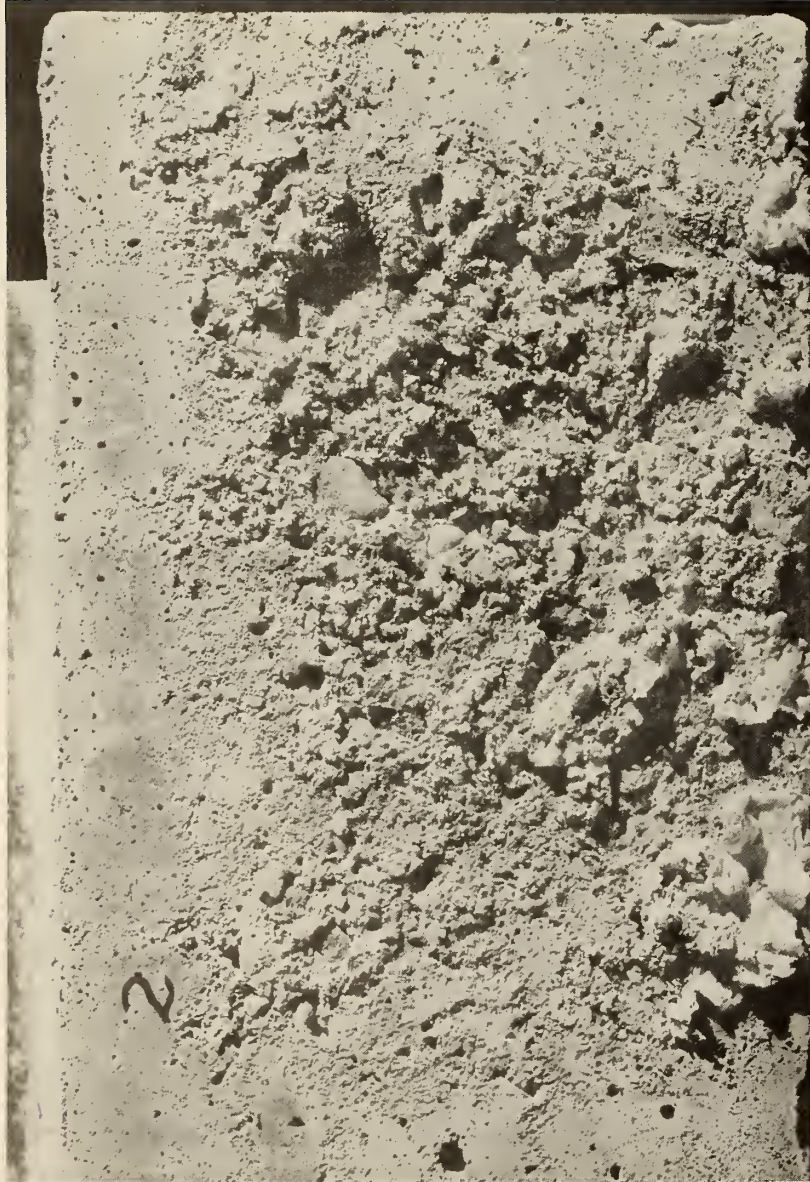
Damage to the unimpregnated zone of the treated slab. This is a photograph of a vertical side of the treated slab. The damage began below the area protected by polymer. The impregnated upper zone of the concrete was undamaged.
